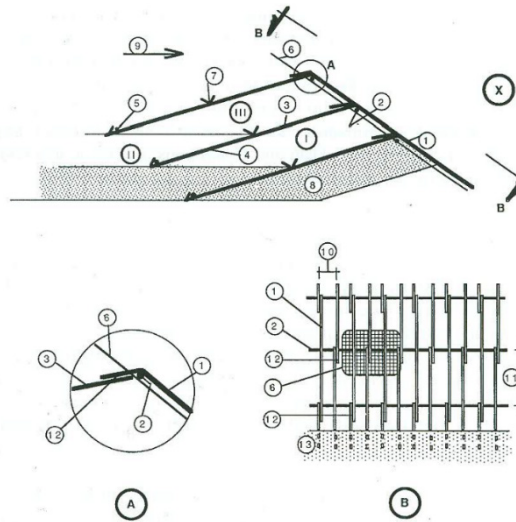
Proposed construction details for reinforced rockfill (ICOLD, 1993)
